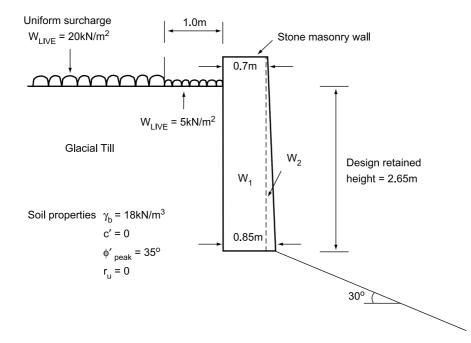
Typical cross section for strengthening of existing wall - Scheme B
